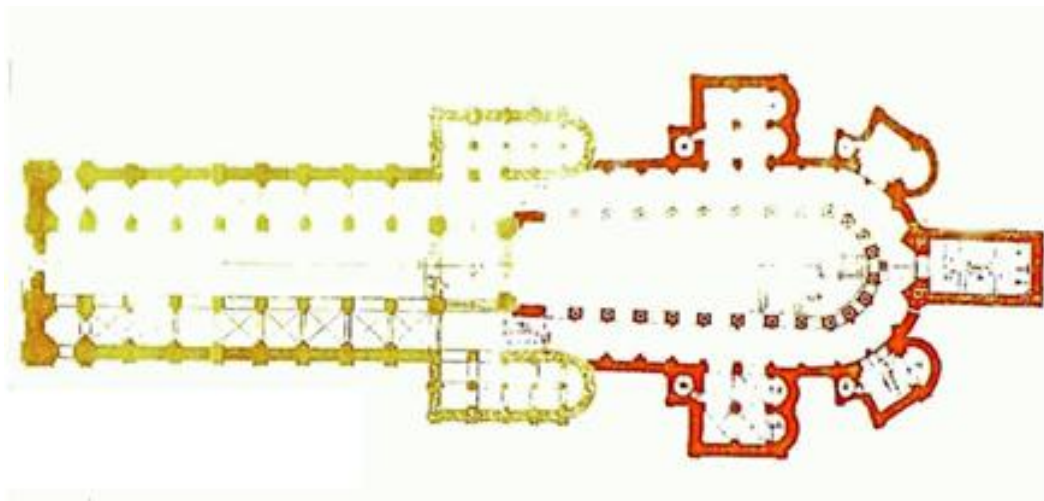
Ground floor plan of Canterbury Cathedral after Archbishop's Anselm reconstruction from 1096 until 1130 - The red color indicates the new choir
